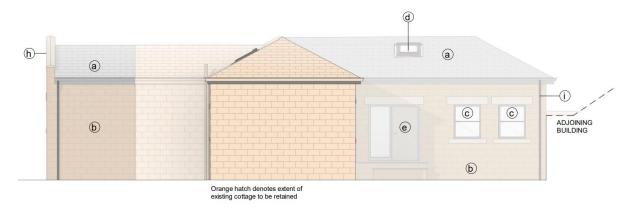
Proposed west elevation of The Cottage, 1:100.
